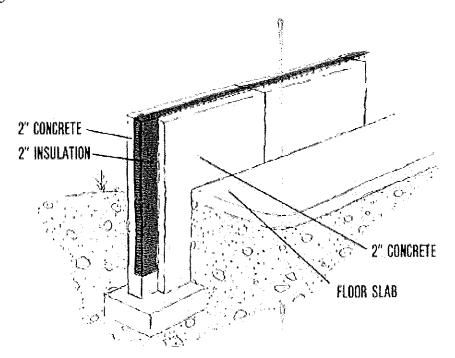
Pre-cast tilt-up concrete wall panels (R=11). Pre-cast tilt-up concrete wall panels may be insulated using waterproof rigid insulation. This type of wall is sometimes used for milking parlors and milk houses.
